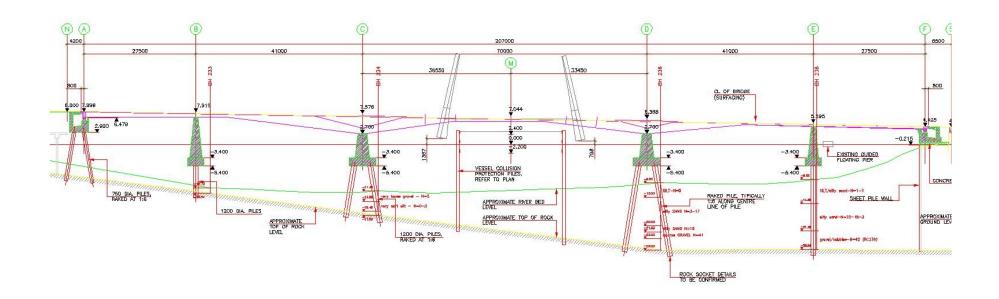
Section of Proposed Bridge showing the piled abutments and the four piled piers, anti-collision fenders and the vertical lift section.
